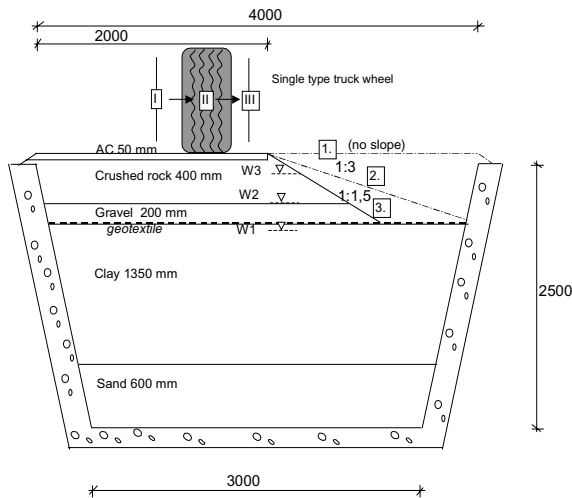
Cross section of low-volume road structures in Otaniemi test basin.
